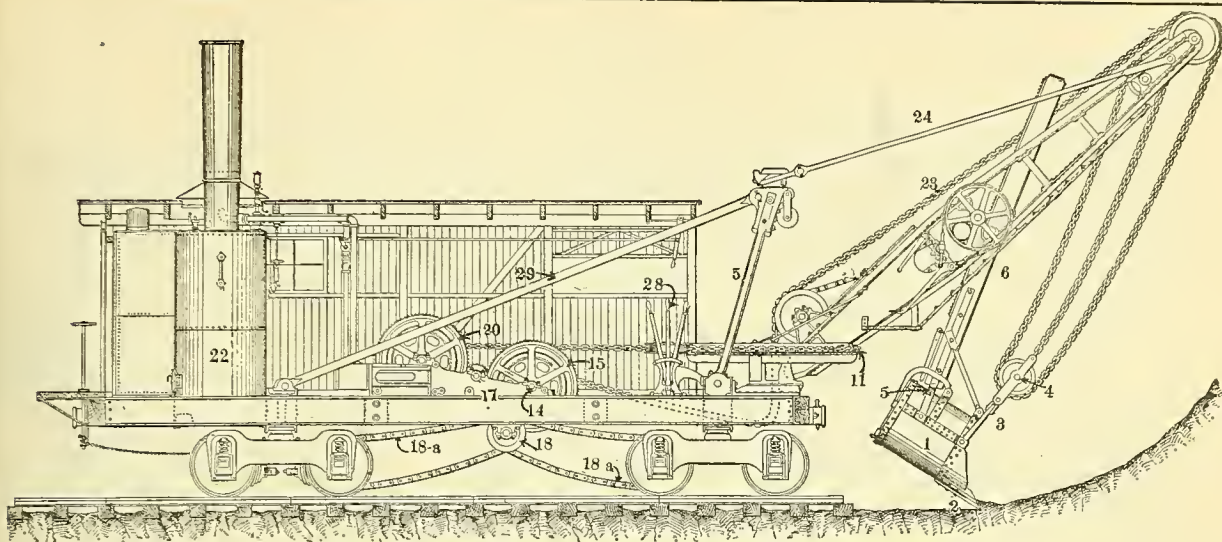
Sectional Side Elevation showing Dipper just before filling.
